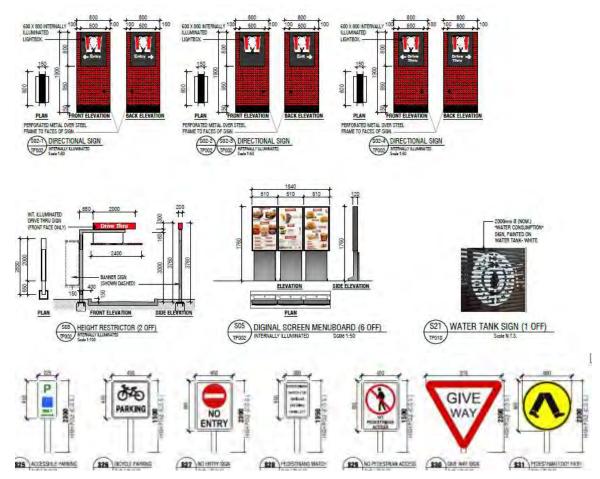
Proposed Street/Directional Signage (Source: Voda Building Services)
